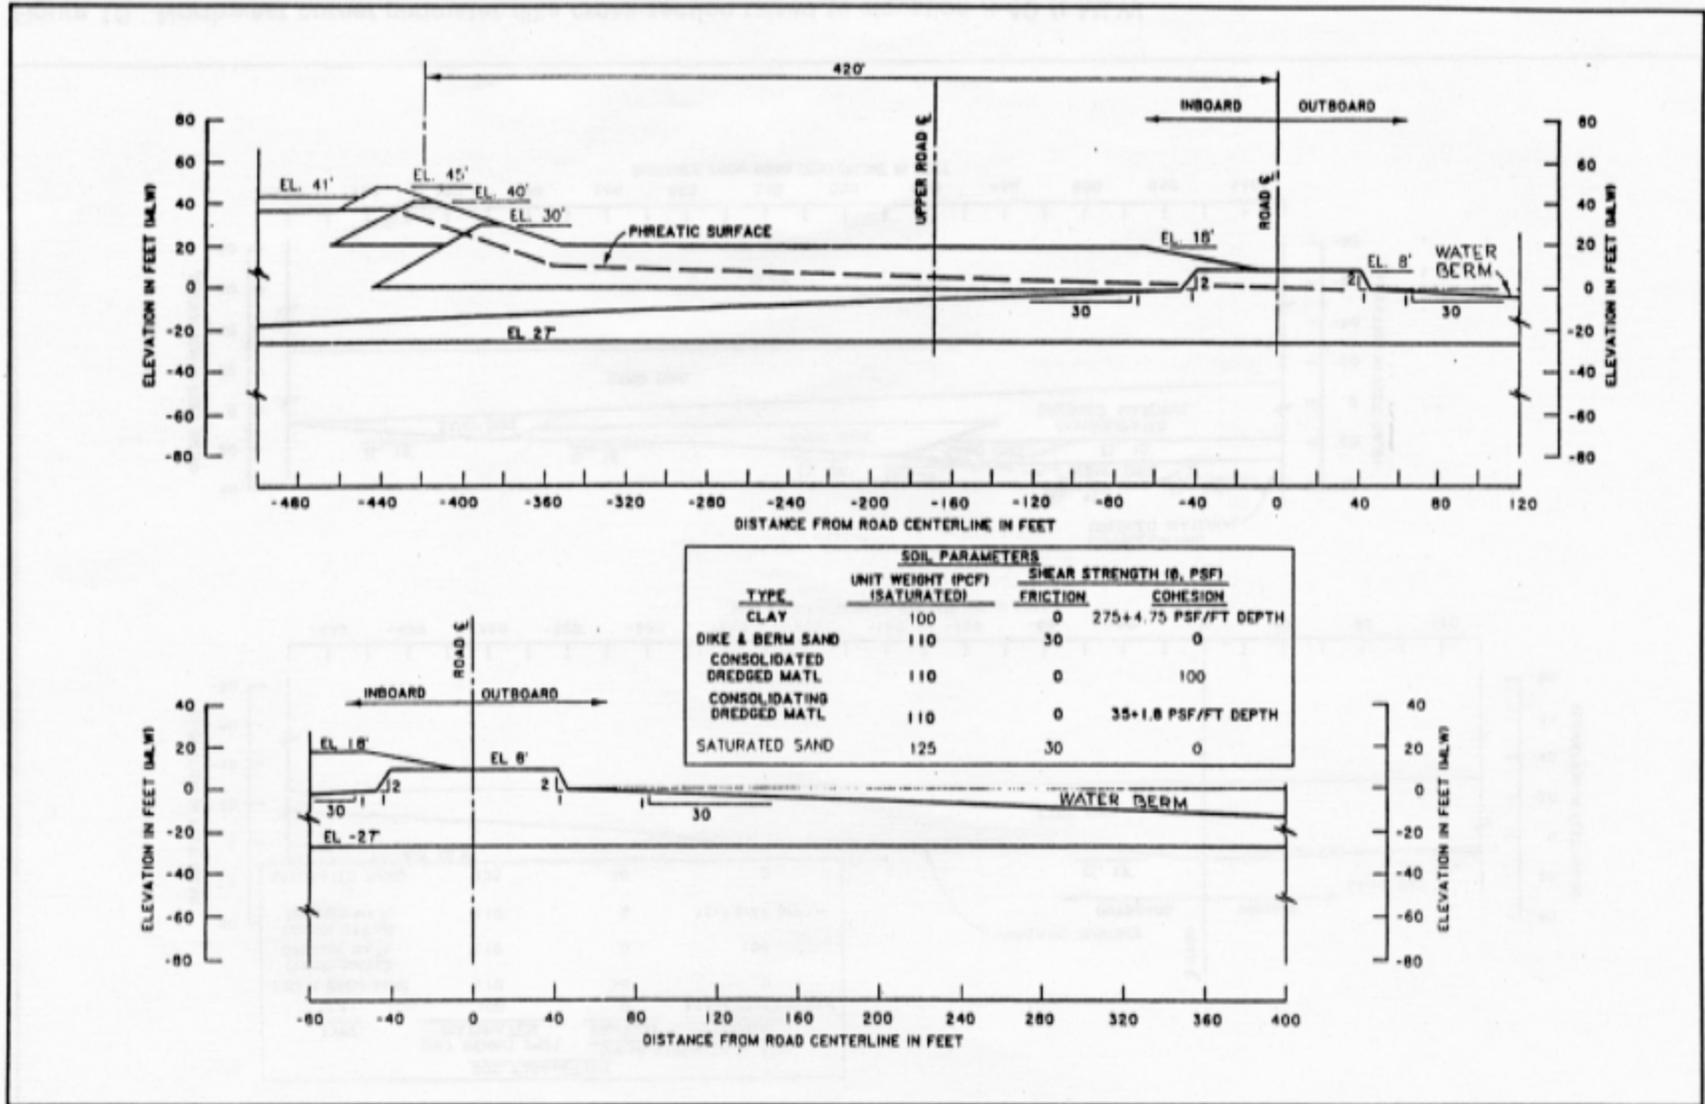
North perimeter dike cross-section raised to elevation +45 ft MLW
